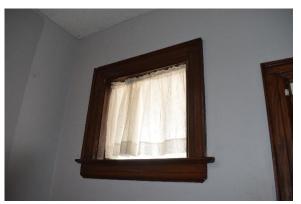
Wood framed window in the southwest corner of the entryway, looking southwest
